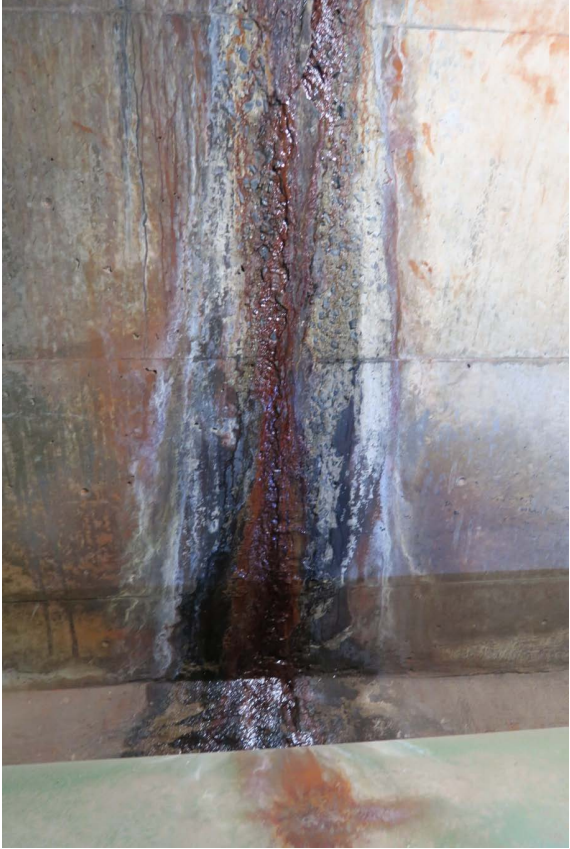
Embankment material seeping into outlet conduit at CH 106 (as measured from inside face of outlet tower in downstream direction).
